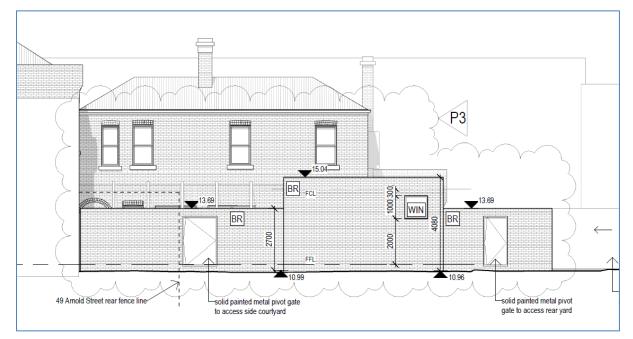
extract of the proposed north elevation, including the fence (Source: applicant).
